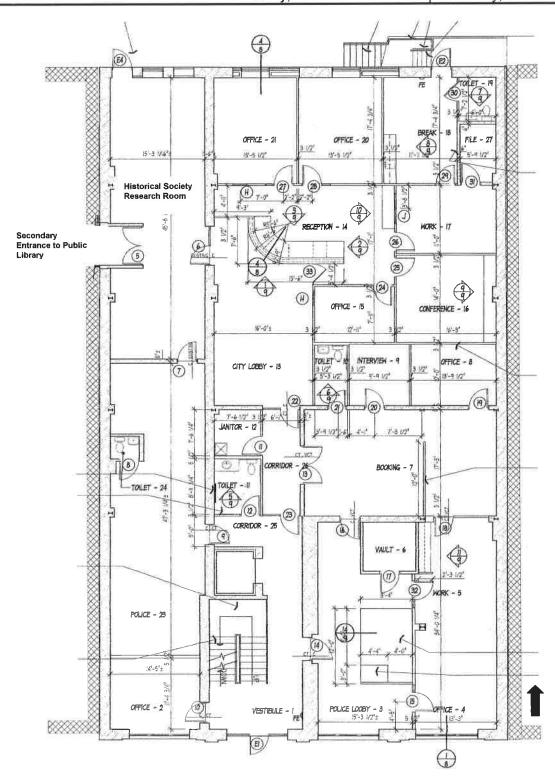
FIRST FLOOR PLAN, NOT TO SCALE (Gardner Architecture 2003)
